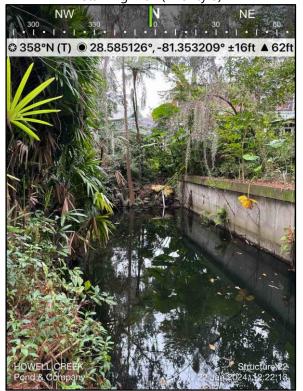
Structure 21; Concrete Bag Retaining Wall (Priority 0)
